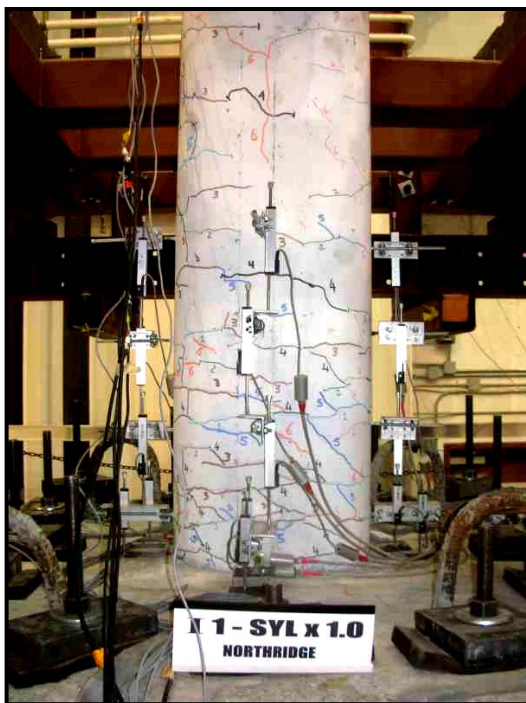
First Concrete Spalling Specimens I1 (SYLx1.0)
